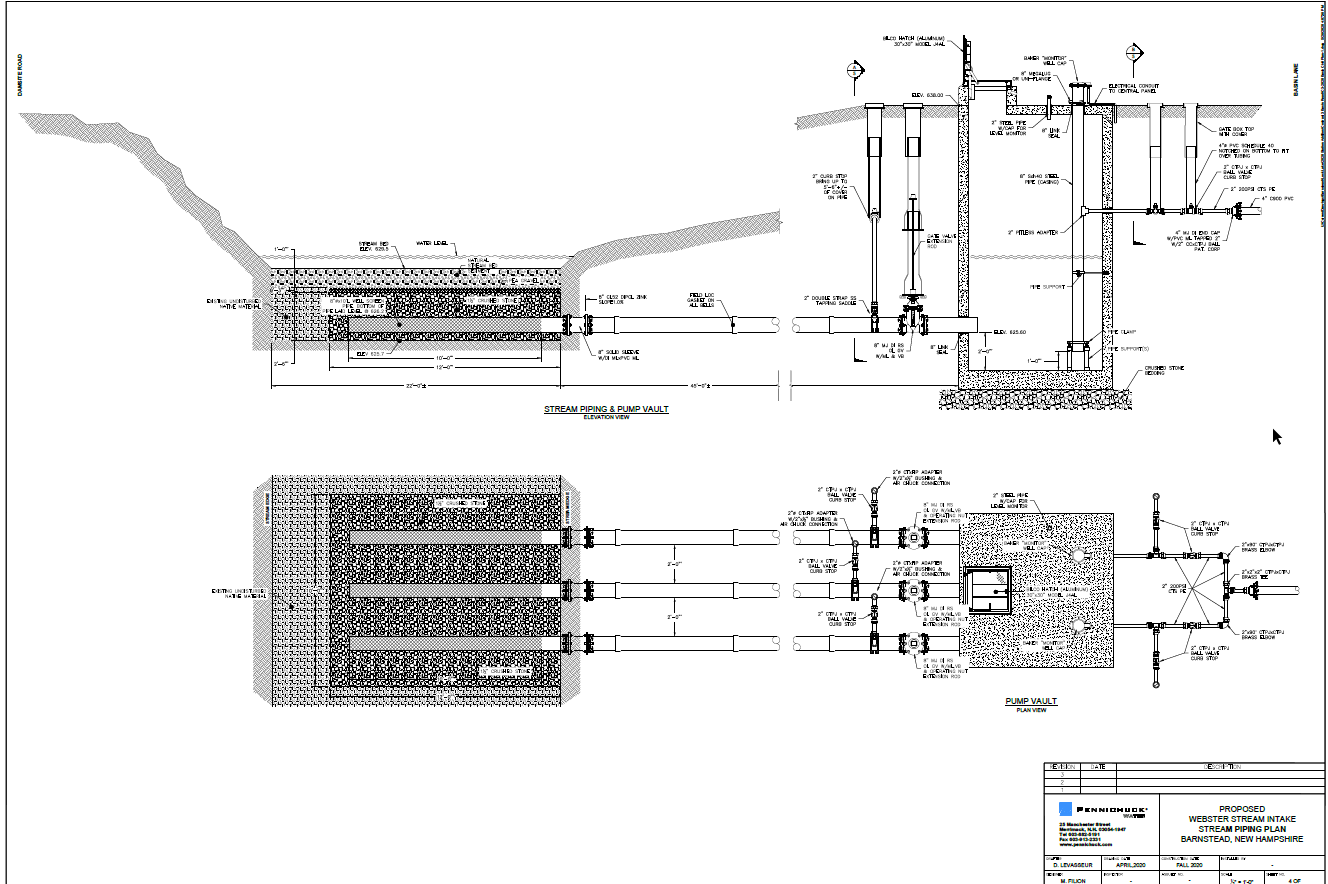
Site Plan overview of infiltration gallery and pump vault ²
